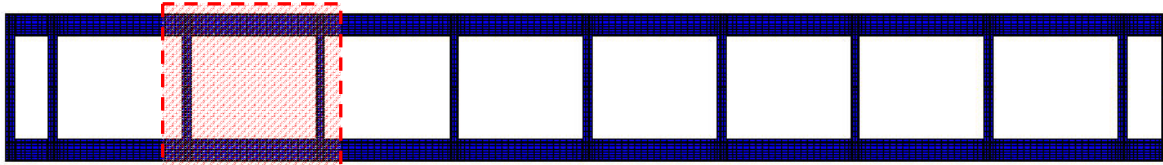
Numbering of floor beams along bridge length (no deck shown).
